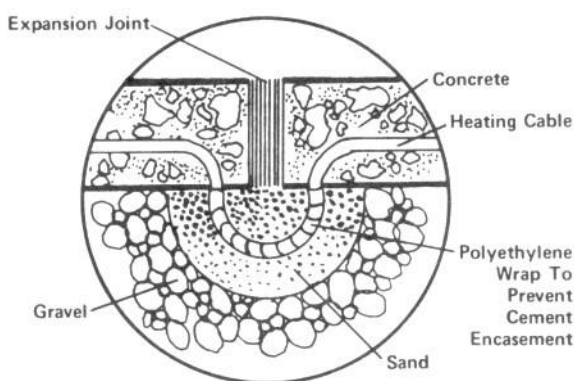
A METHOD OF CROSSING EXPANSION JOINT
